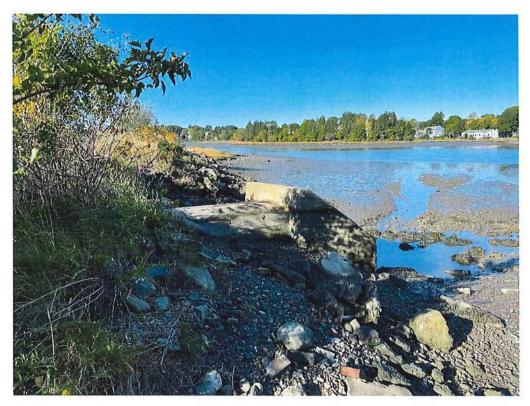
Existing outfall headwall, exposed 48" RCP pipe, and tidal embankment looking west at low tide. Taken 9/29/22
